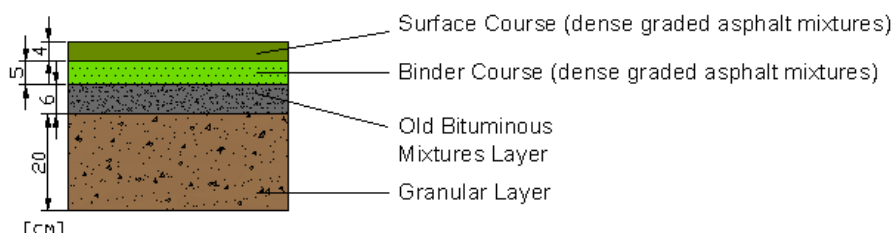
Hypothetic Pavement structure the type of solution A applied to B solution section
